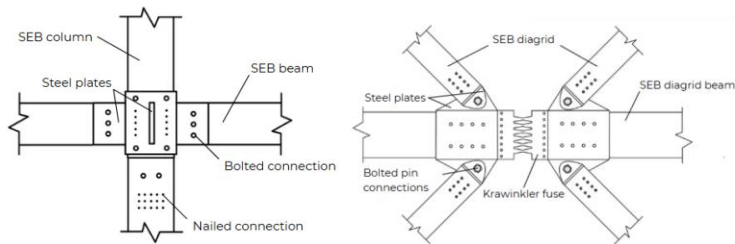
Shop drawing of typical SEB connection: beam-to-column (left) and beam-to-diagrid (right)
